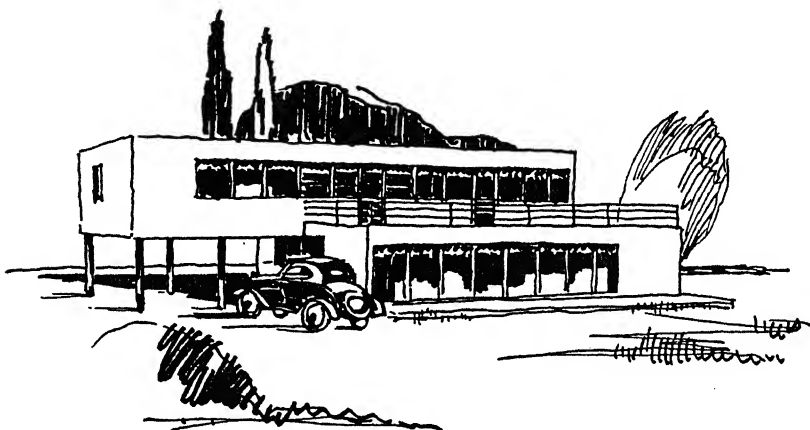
ELEVATION, HOUSE H, FIG. 136
